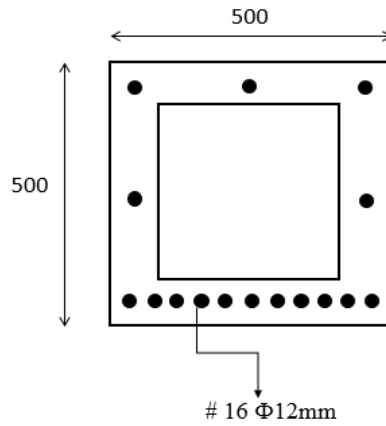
Cross Sections of Lampert and Thurliman Specimens
